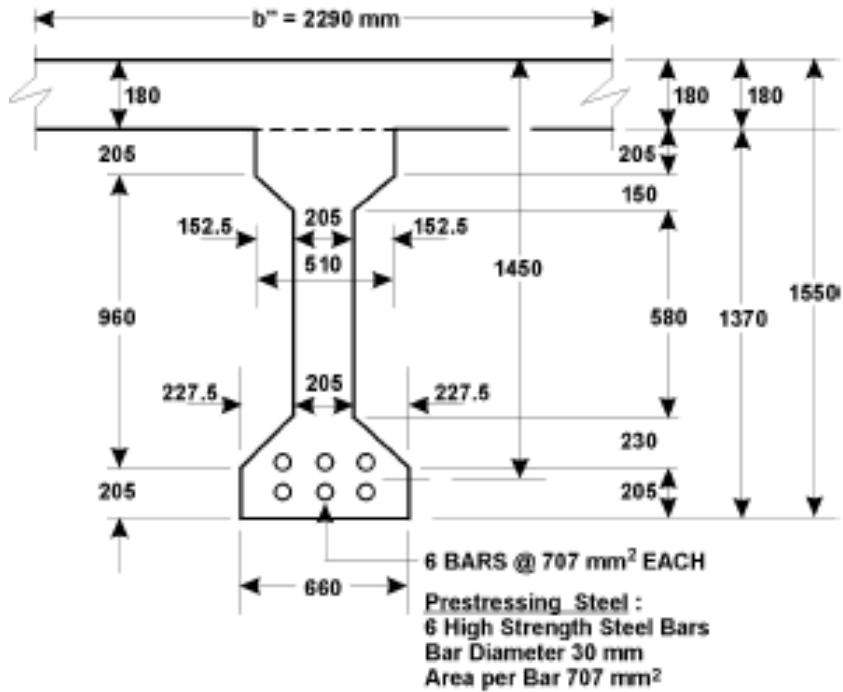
Cross section of interior girder at mid-span (DND, 2007a)
